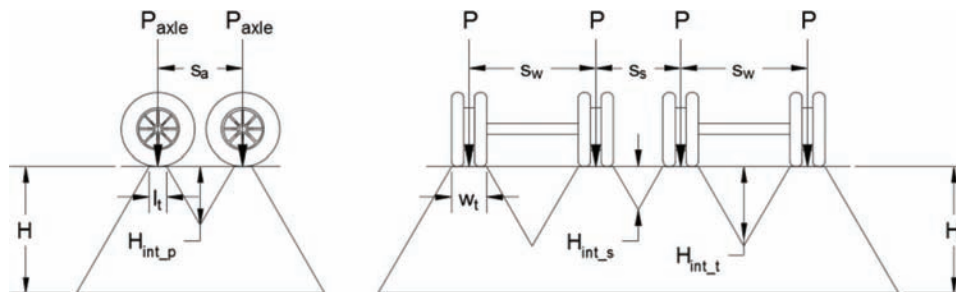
Longitudinal and transverse view of HL-93 design tandem, two lanes loaded.
